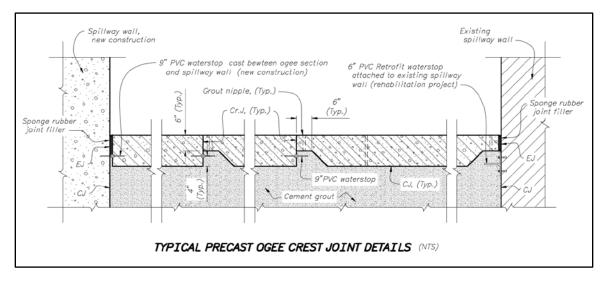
Showing typical joint details between each crest section, and spillway walls. New construction is shown on the left, and rehabilitation on the right.
